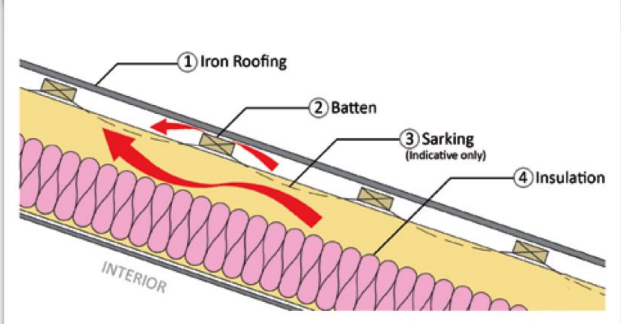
ROOF DETAIL : VENTED SKILLION & IRON ROOF
